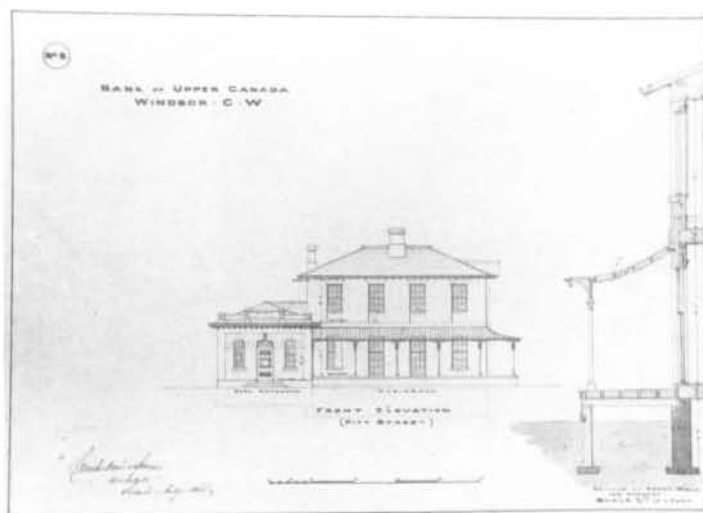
Cumberland & Storm, Bank of Upper Canada, Windsor, 1855, Pitt Street elevation and section detail, Horwood Collection, Ontario Archives (99) 5. (Photo: Ontario Archives, Toronto)
